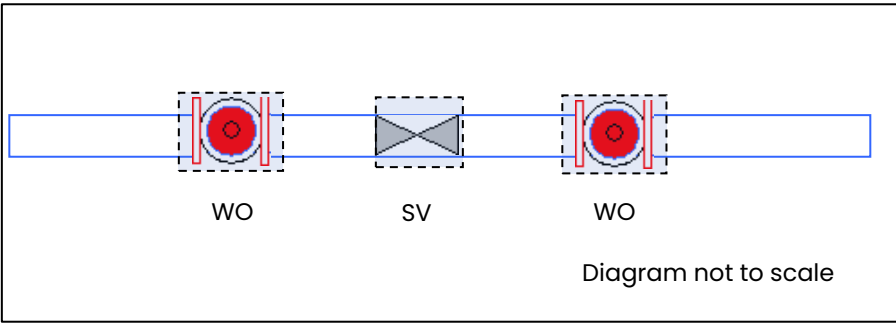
Typical OXO (Hydrant - Valve - Hydrant) Arrangement
